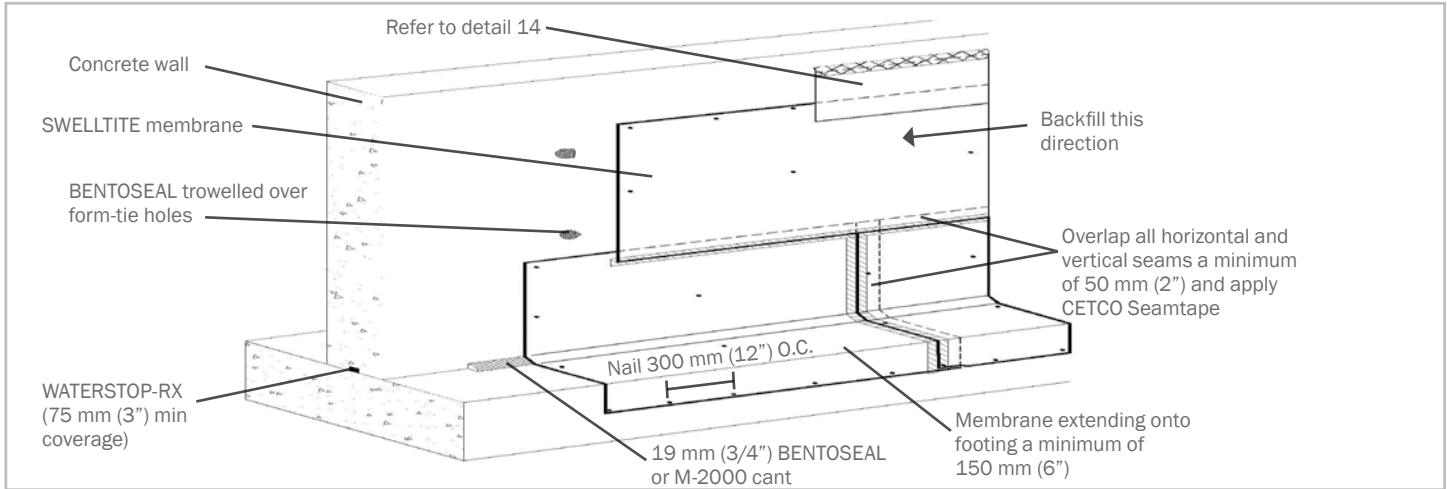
Foundation wall detail (non-hydrostatic condition)
